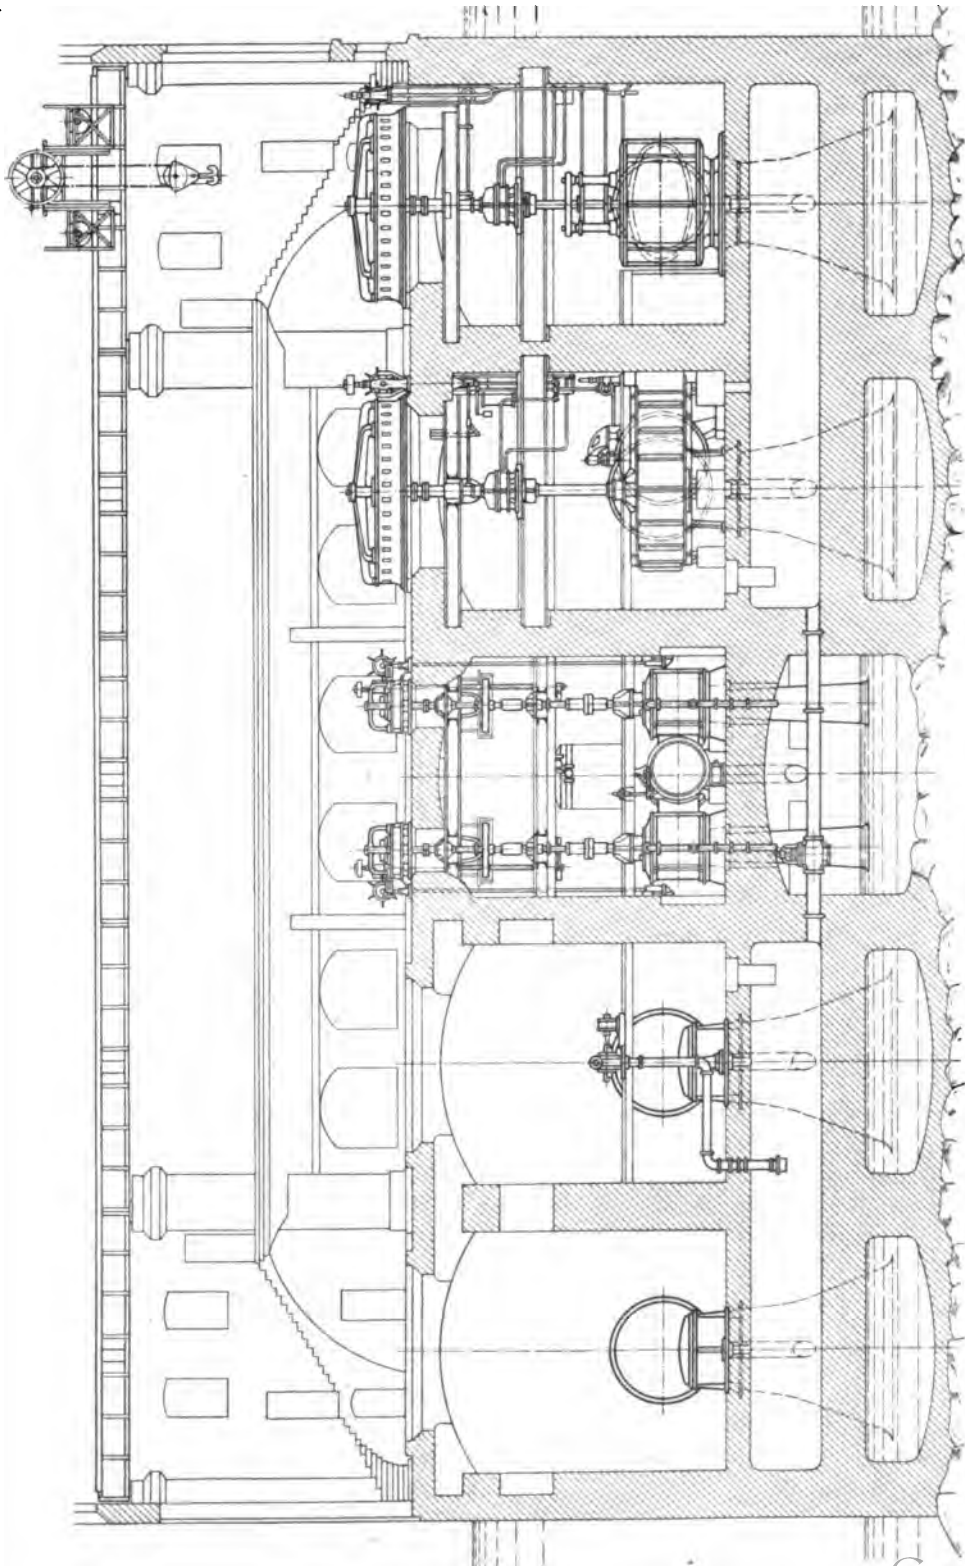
Longitudinal Section of Kjikkelsrud Plant, Norway.
